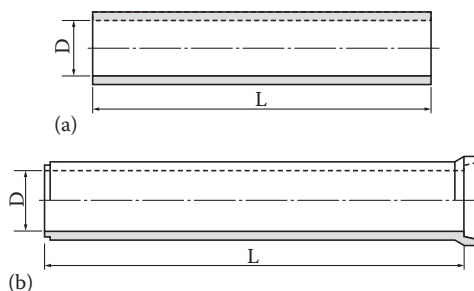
Standard RCP: (a) A pipe and (b) B pipe.
